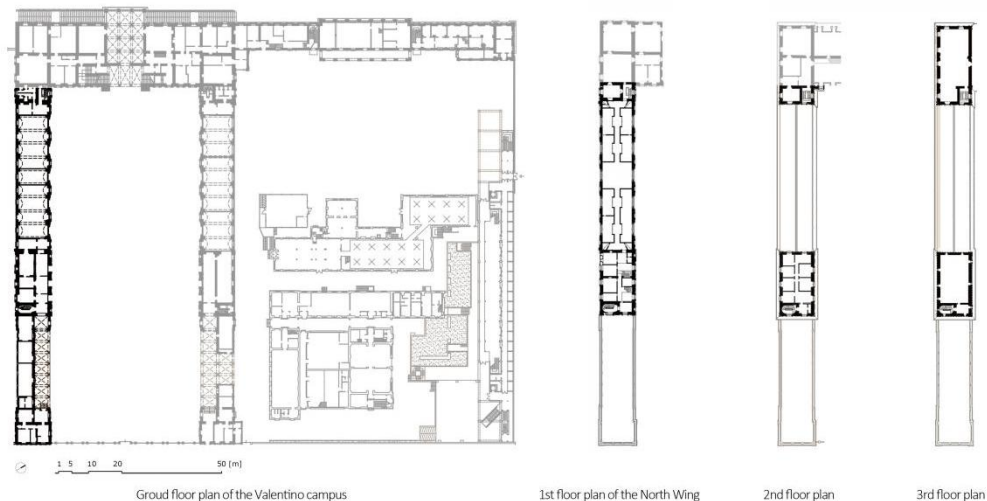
Ground floor plan of the Valentino campus, and 1st, 2nd, 3rd floor plans(North wing).
